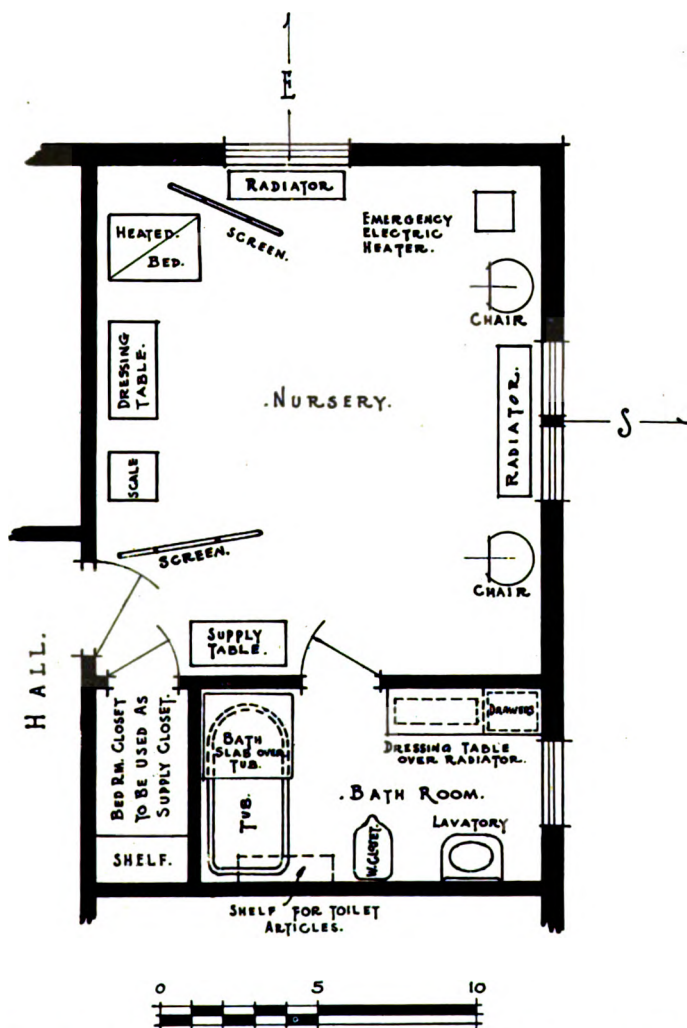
Plan for arrangement of stations in a private home, consisting of one large, well ventilated and heated room and a bath room.
